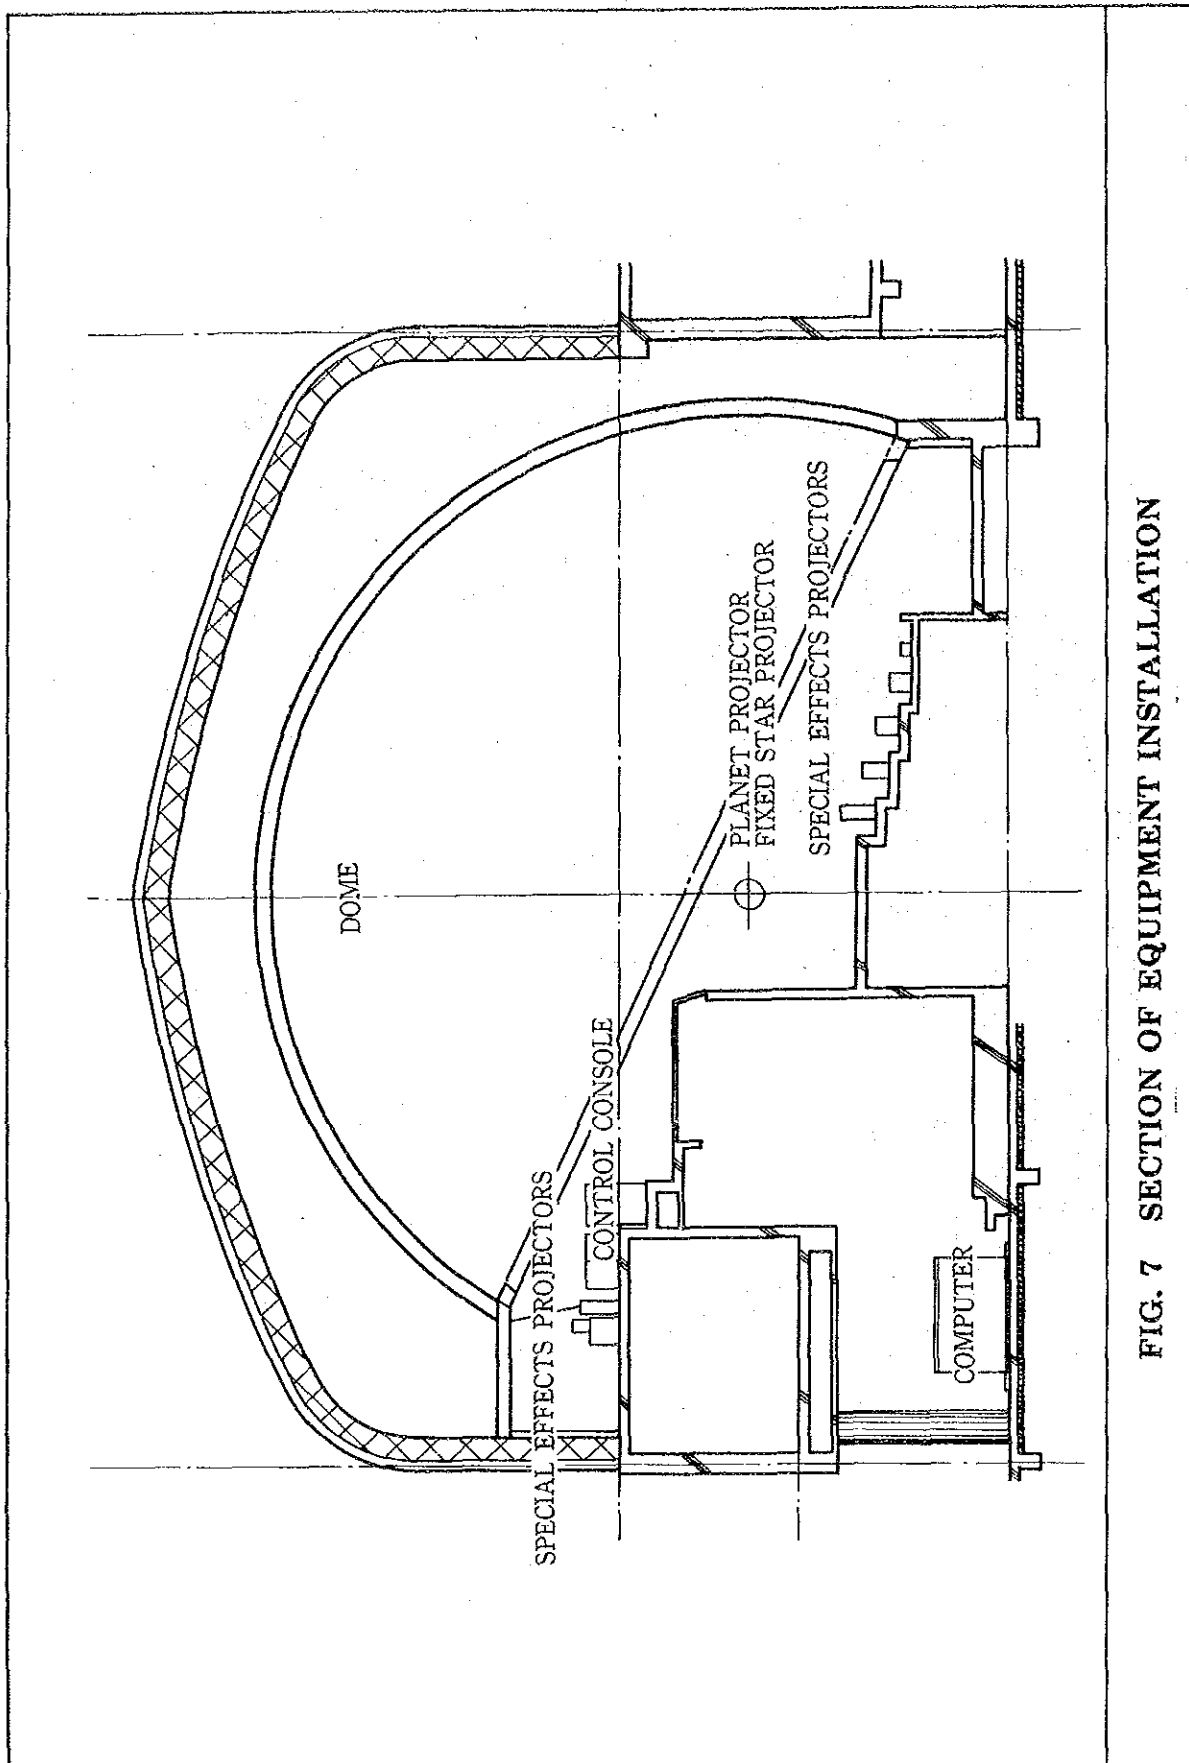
SECTION OF EQUIPMENT INSTALLATION
